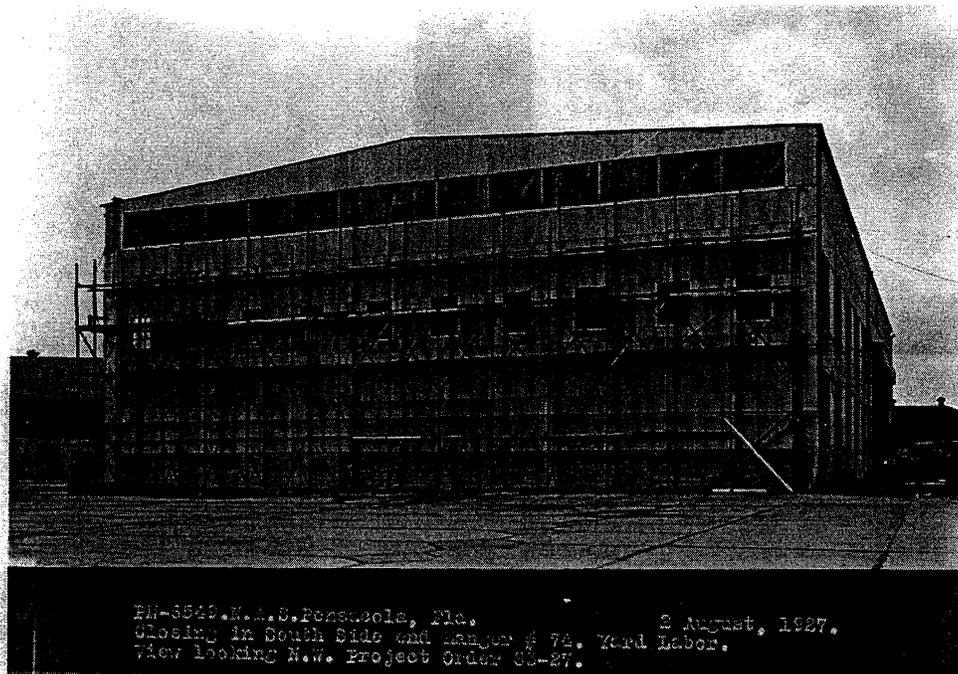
Building No. 74 following major renovations of the south facade in which a concrete protection wall enclosed the main entrance, dated August 2, 1927. (Photo courtesy of Still Pictures Unit, National Archives, College Park, Maryland).
